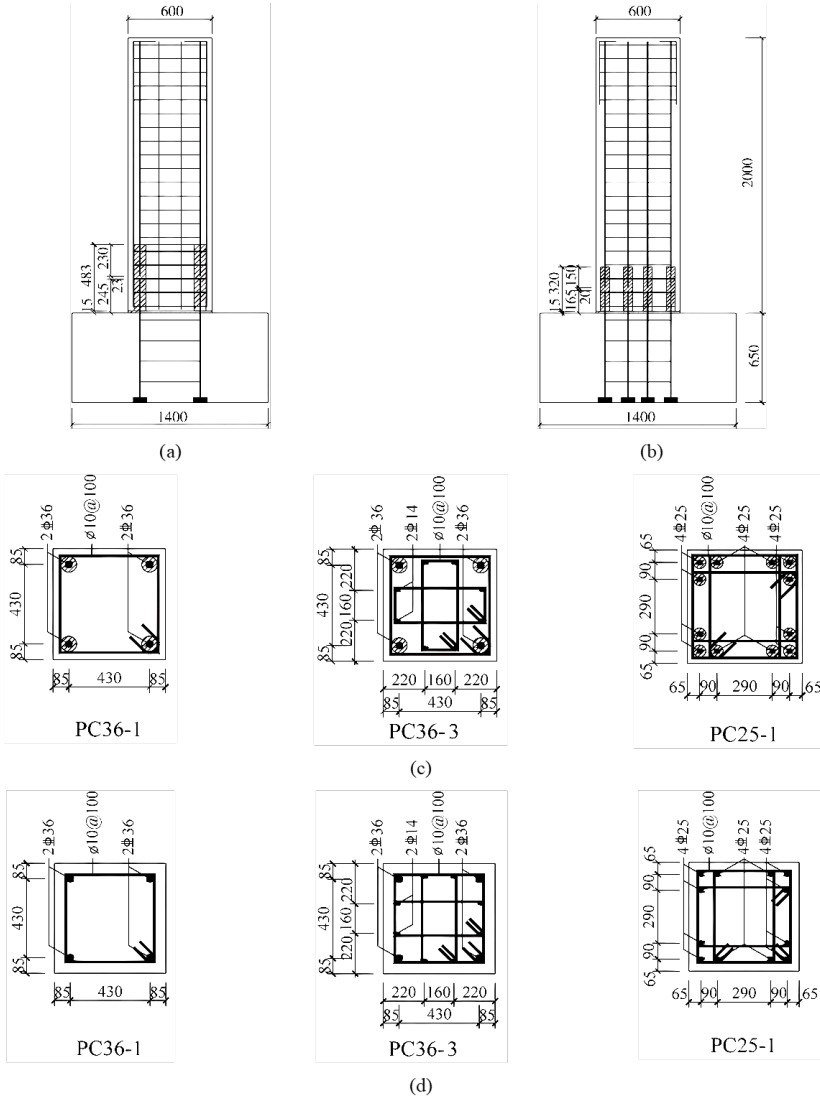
Schematic representation of the specimen design: (a) test specimen PC36-3; (b) test specimen PC25-1; (c) drawing of bushing zone reinforcement; (d) drawing of column top reinforcement.
